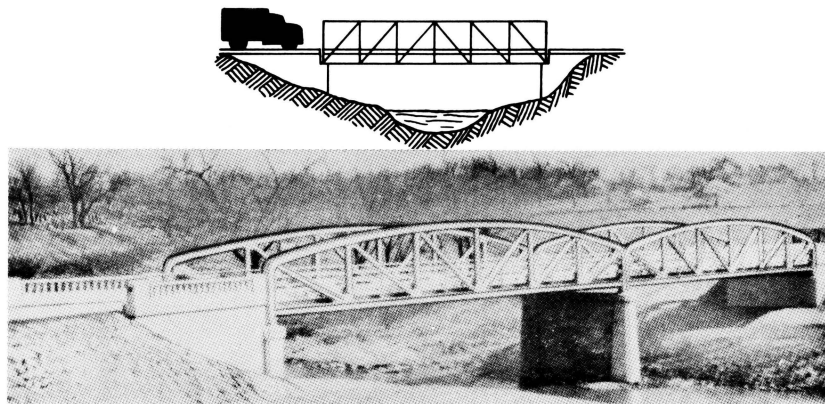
Diagram and photo of steel truss bridges, half-through type.
